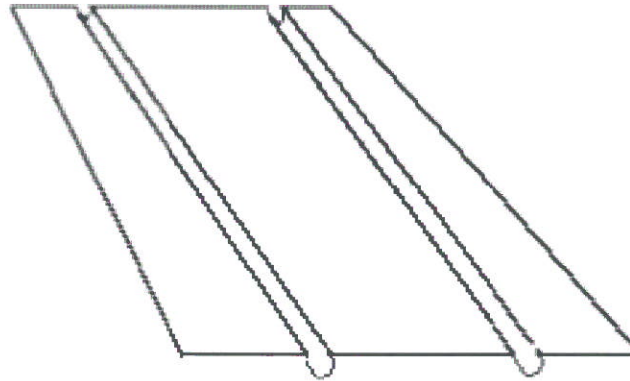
THE PANEL CAN BE STAPLED BETWEEN JOISTS TO FLOORING BOARD FROM UNDERNEATH
